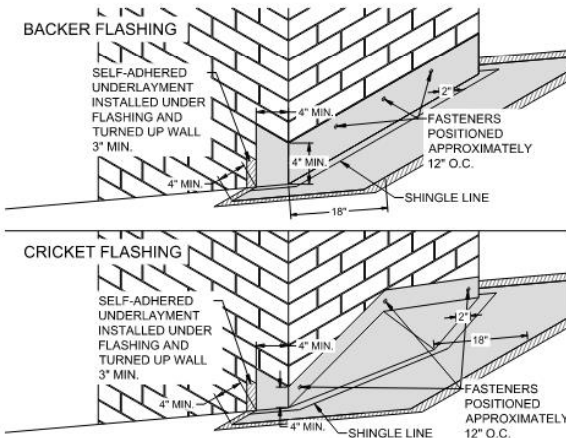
Chimney Saddle and Cricket Flashing Applications
